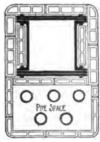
Here the Pipes Are Carried Up in a Separate Space Alongside the Column
